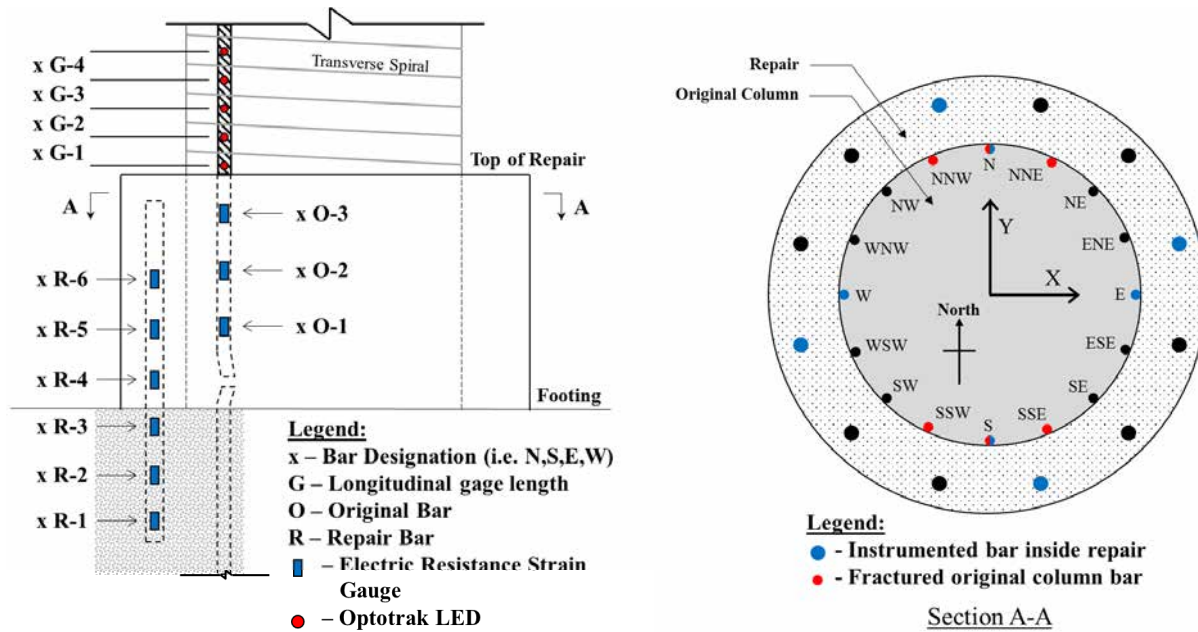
Repair #2 Instrumentation labels and repair cross section layout.
